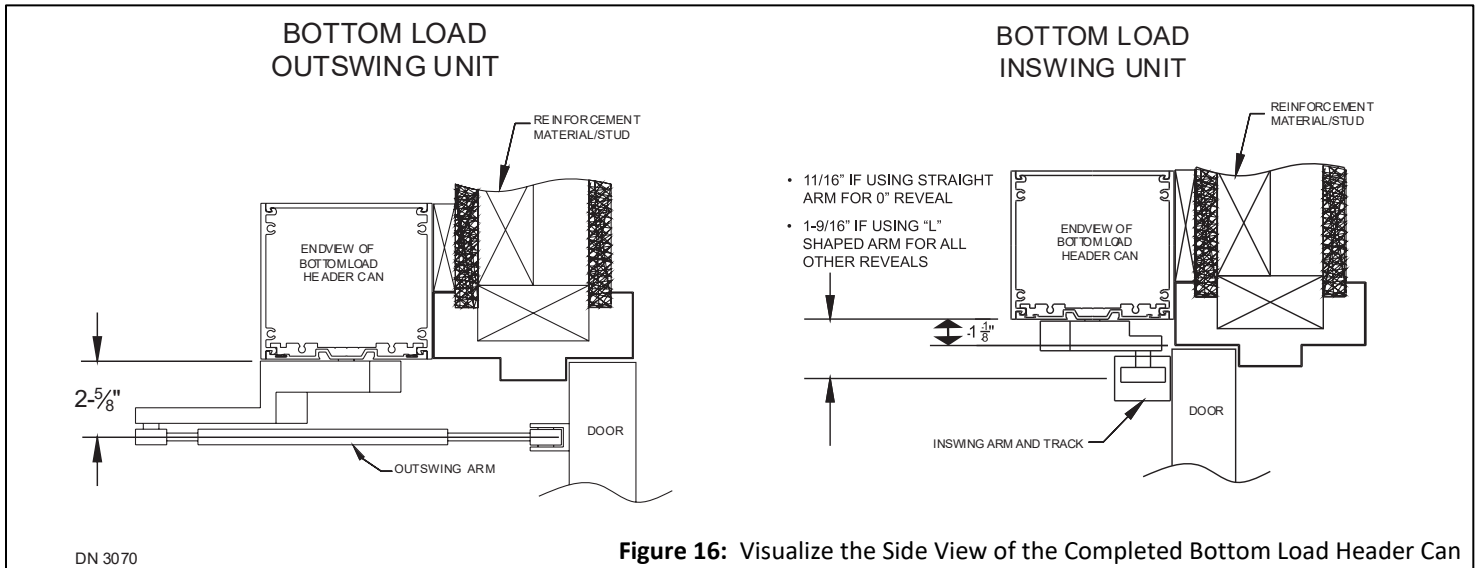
Visualize the Side View of the Completed Bottom Load Header Can
